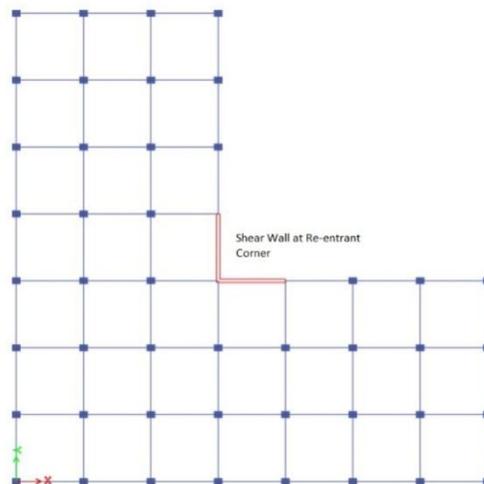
Plan- RC Framed Structures having L Shape Geometry Shape with Shear Wall
